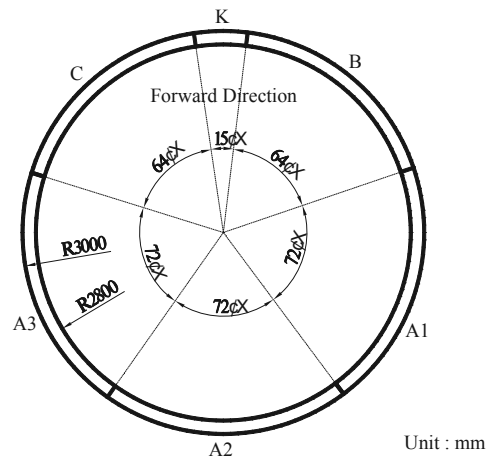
Cross section of the Taipei MRT Xinyi line tunnel.
